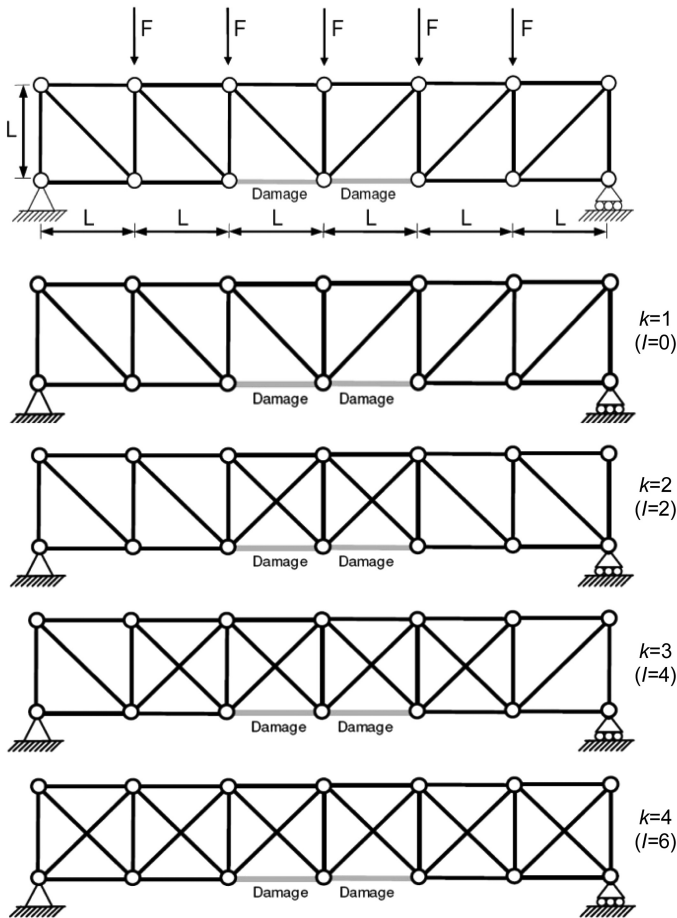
Truss systems undergoing damage of two members (adapted from Biondini et al. 2008).
